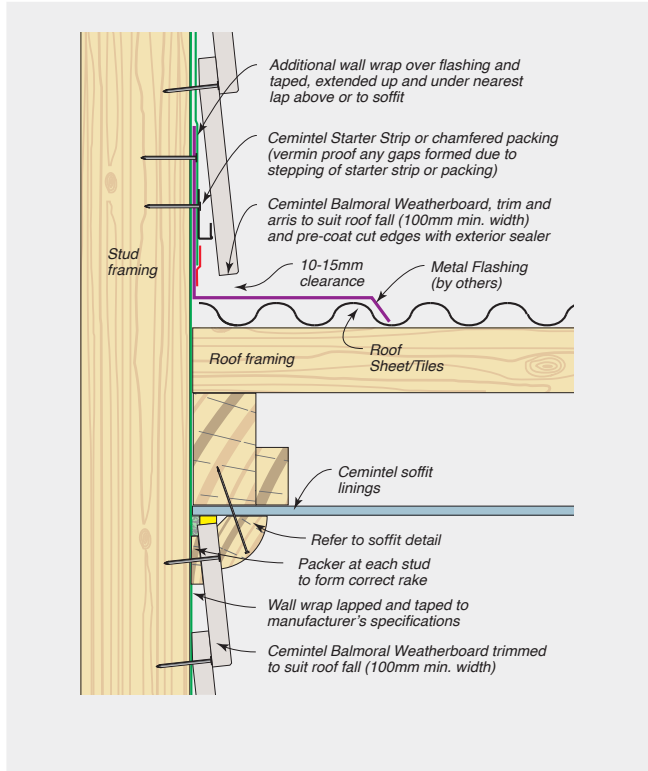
Typical Junction of Cladding with External Roofing
